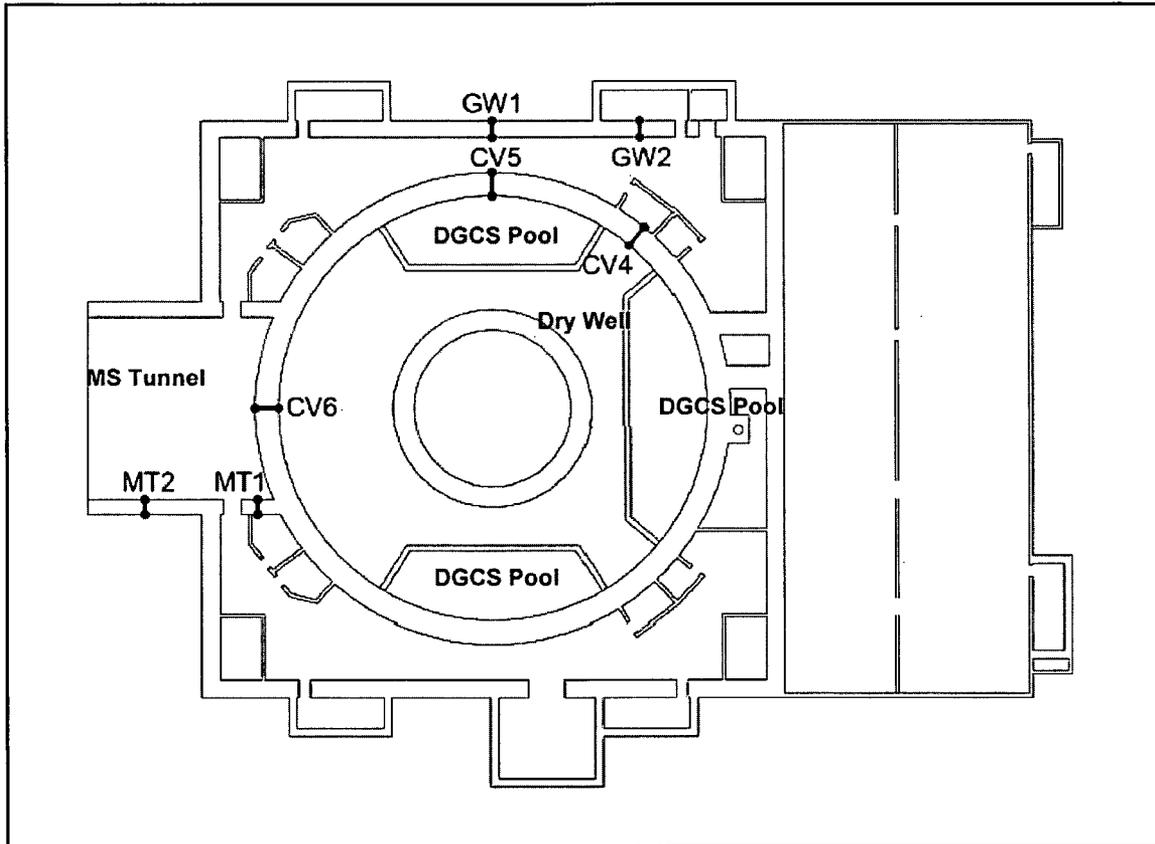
(1) Analyzed Section (Plan, DW)
